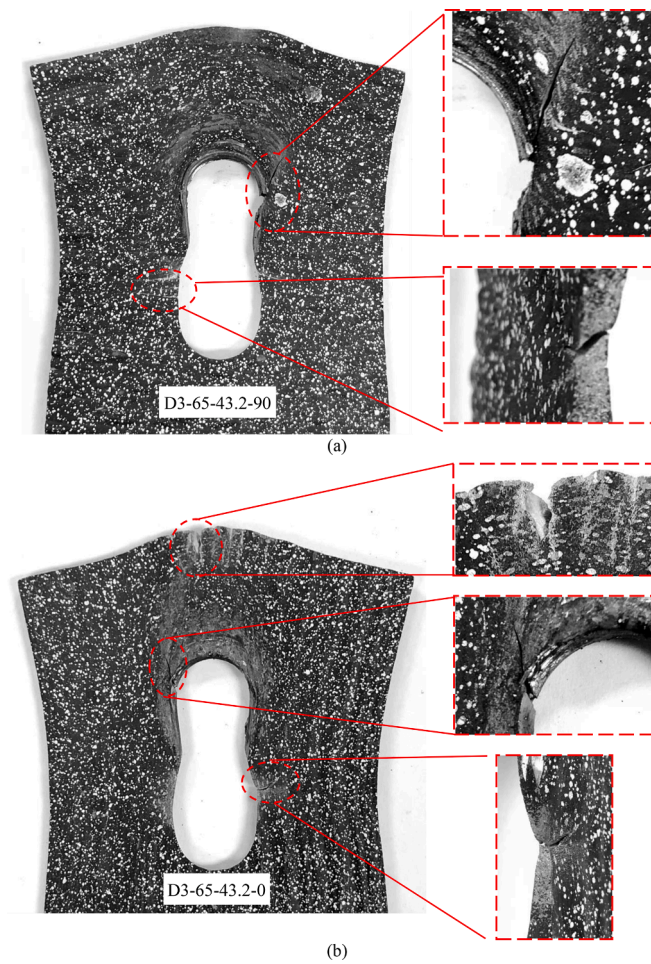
Specimens failing in incidental block shear (a) Specimen D3-65-43.2-90 and (b) Specimen D3-65-43.2-0.
